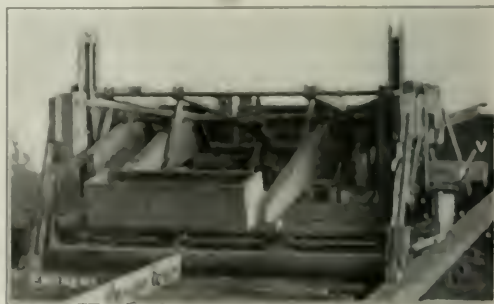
REAR VIEW OF HAYLEY PAVING MACHINE
